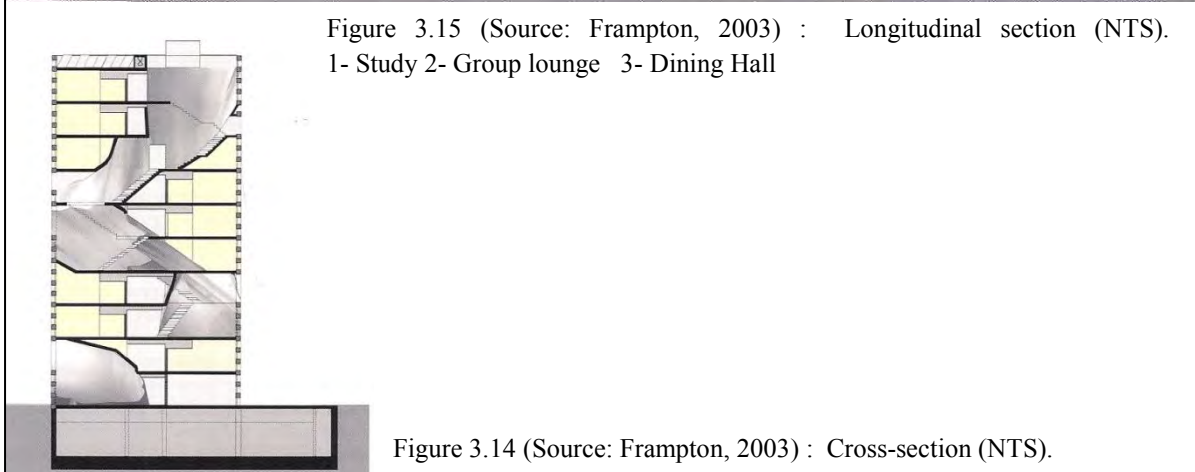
(Source: Frampton, 2003) : Cross-section (NTS).
